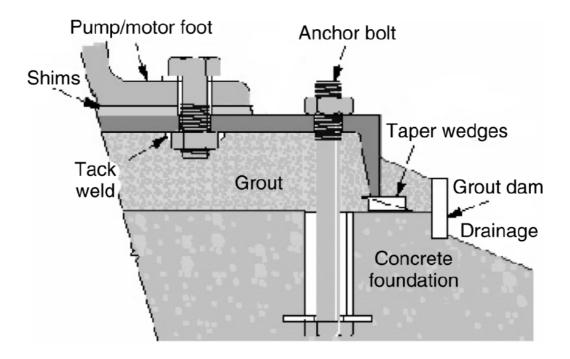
Concrete Grout (Image Source - Berkeley Pumps - USA)
